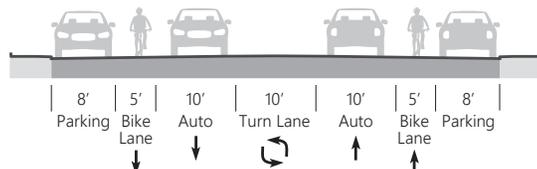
STATE STREET EXISTING CROSS SECTION
